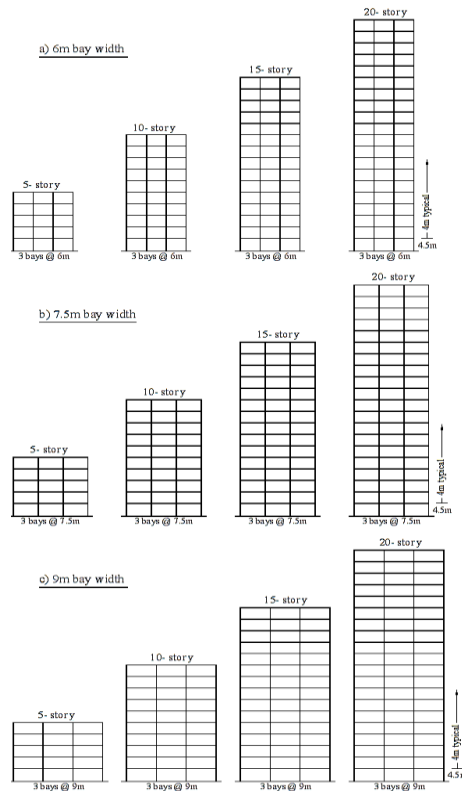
Archetype configurations for a reinforced concrete moment frame system
